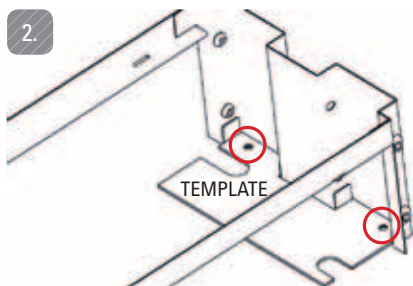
Remove the convector body. Adjust the convector bearing frame to the required position. Mark the holes for convector fixing in the floor.
